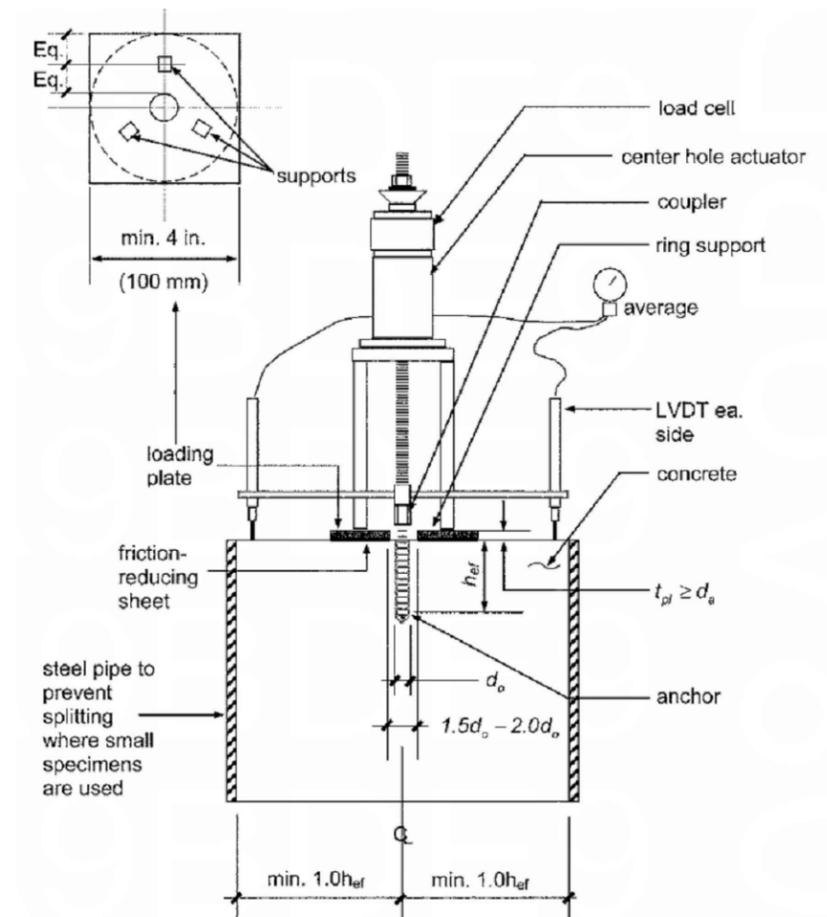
Example of confined tension test setup for adhesive anchors.
